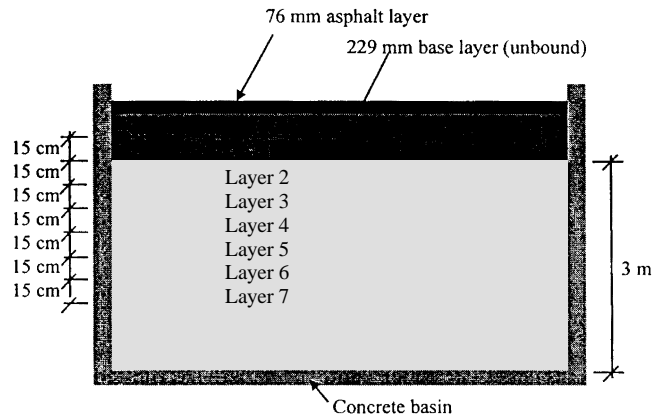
Structural section showing instrumentation plan and levels of test sections, or "Windows" [22].
